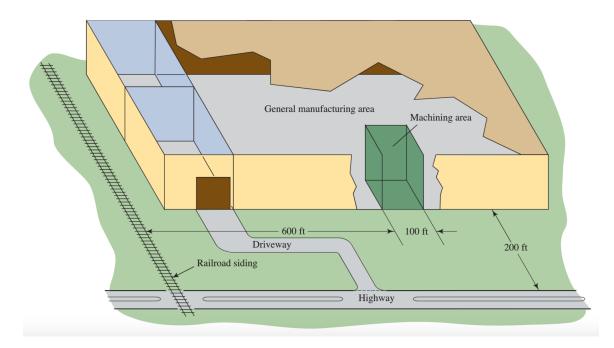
Plot plan of a hypothetical factory building for the design problem.
